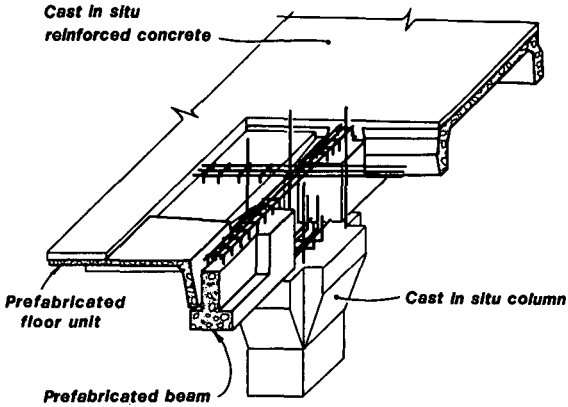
Example of a "Rigid" Beam-Column Connection in a Frame System.
